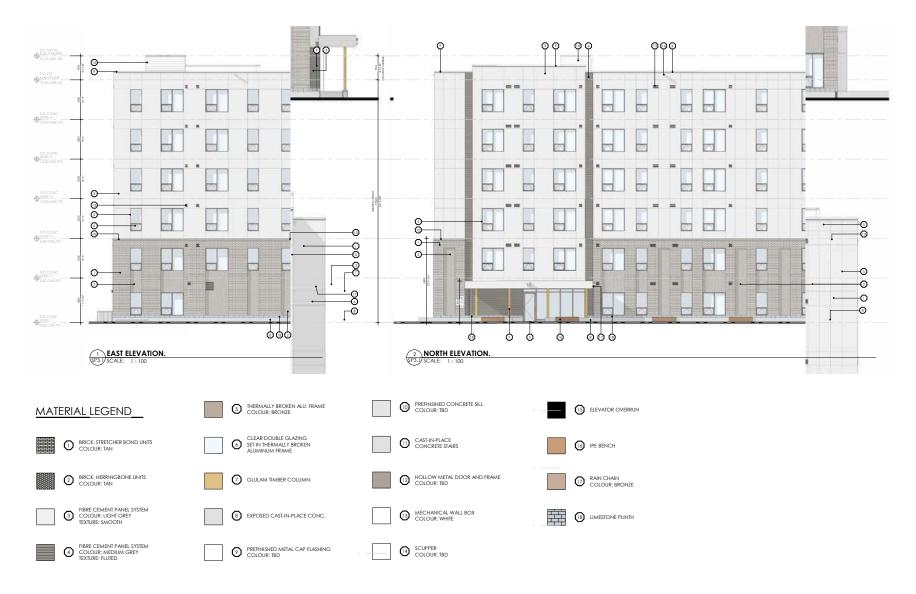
Proposed Development East and North Elevations. (Source: EDGE Architects, July 2023)
